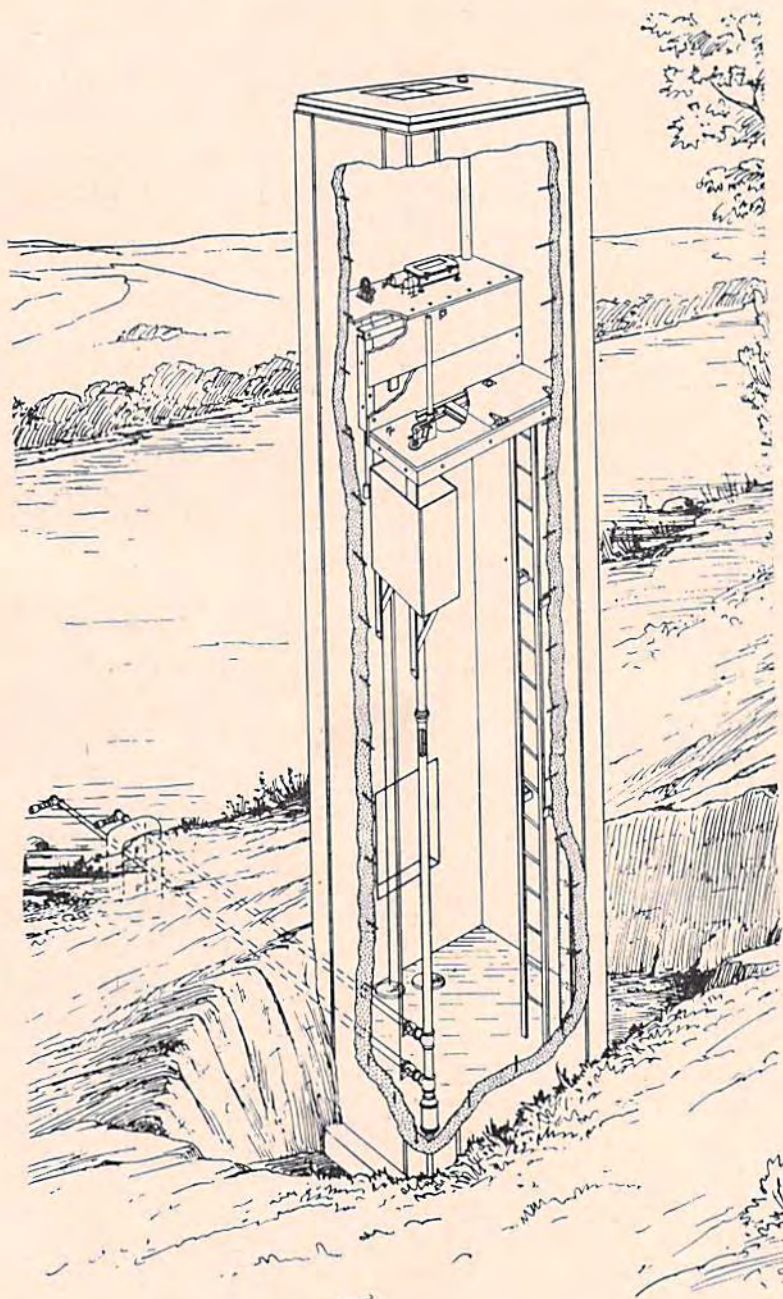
Typical design of river-measurement station showing reinforced concrete well and house for water-stage recorder.
